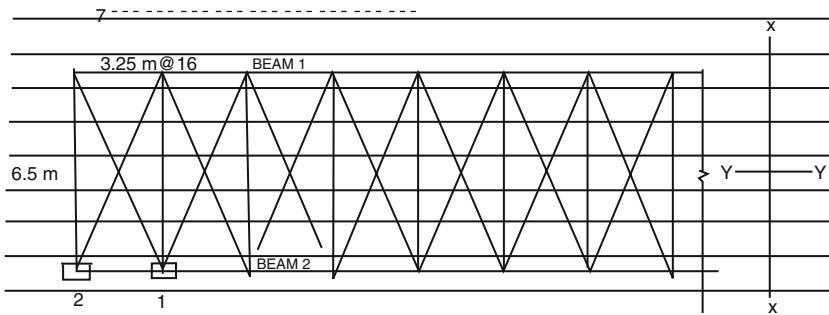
Plan of T100 beam at the edge braced for wind
